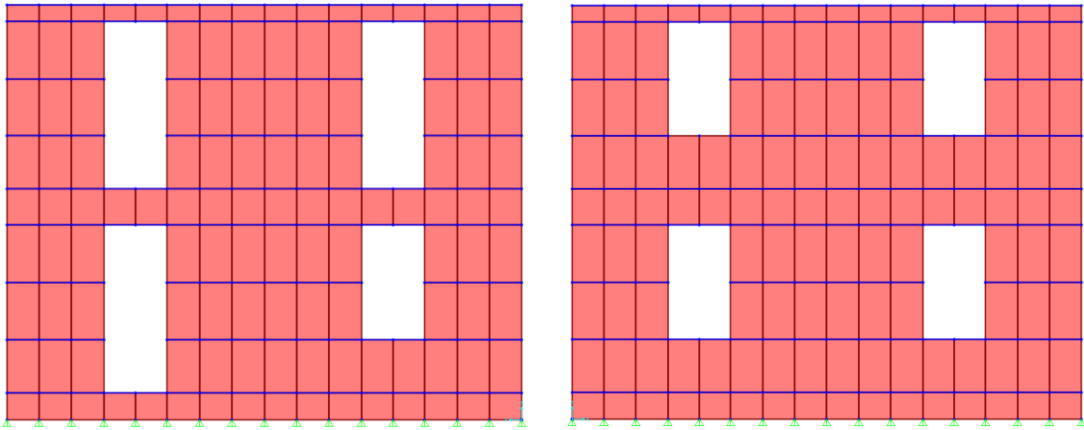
House PL model elevation view, walls along X axis: Door wall (left), Window wall (right)
